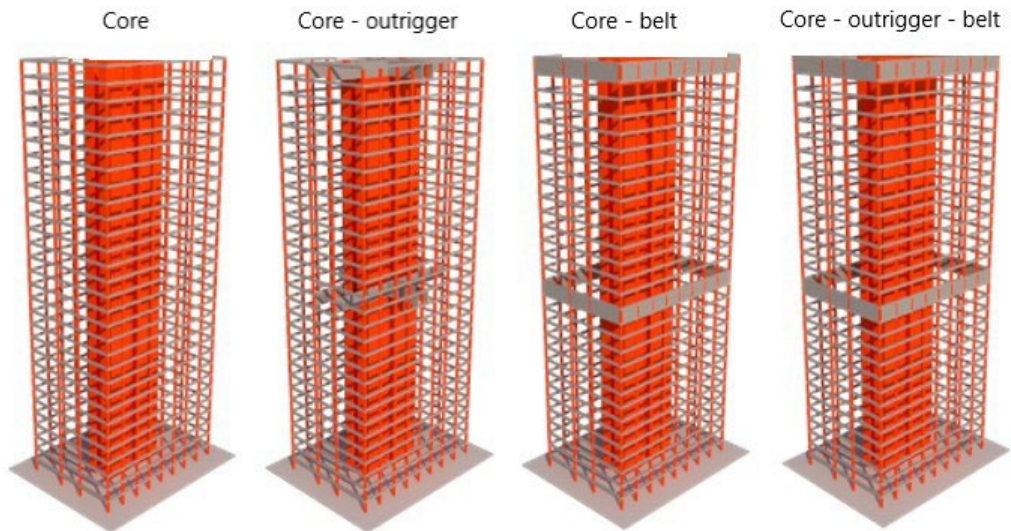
Application of outriggers for tall mass timber buildings: simple core, core and outrigger, core and belt, and core with outrigger and belt.
